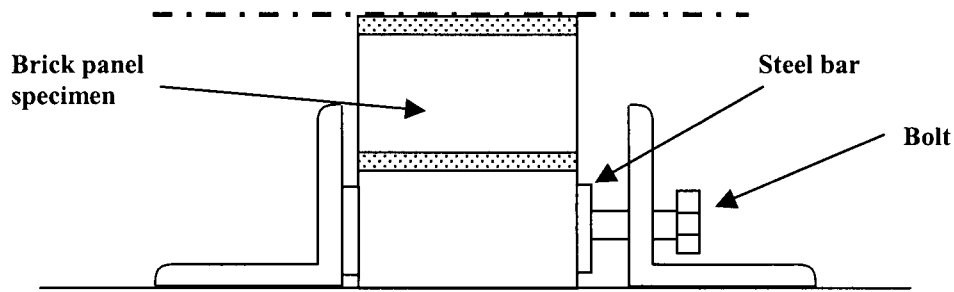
Bolt to control the fixity of the steel bars, which clamped the panel.
